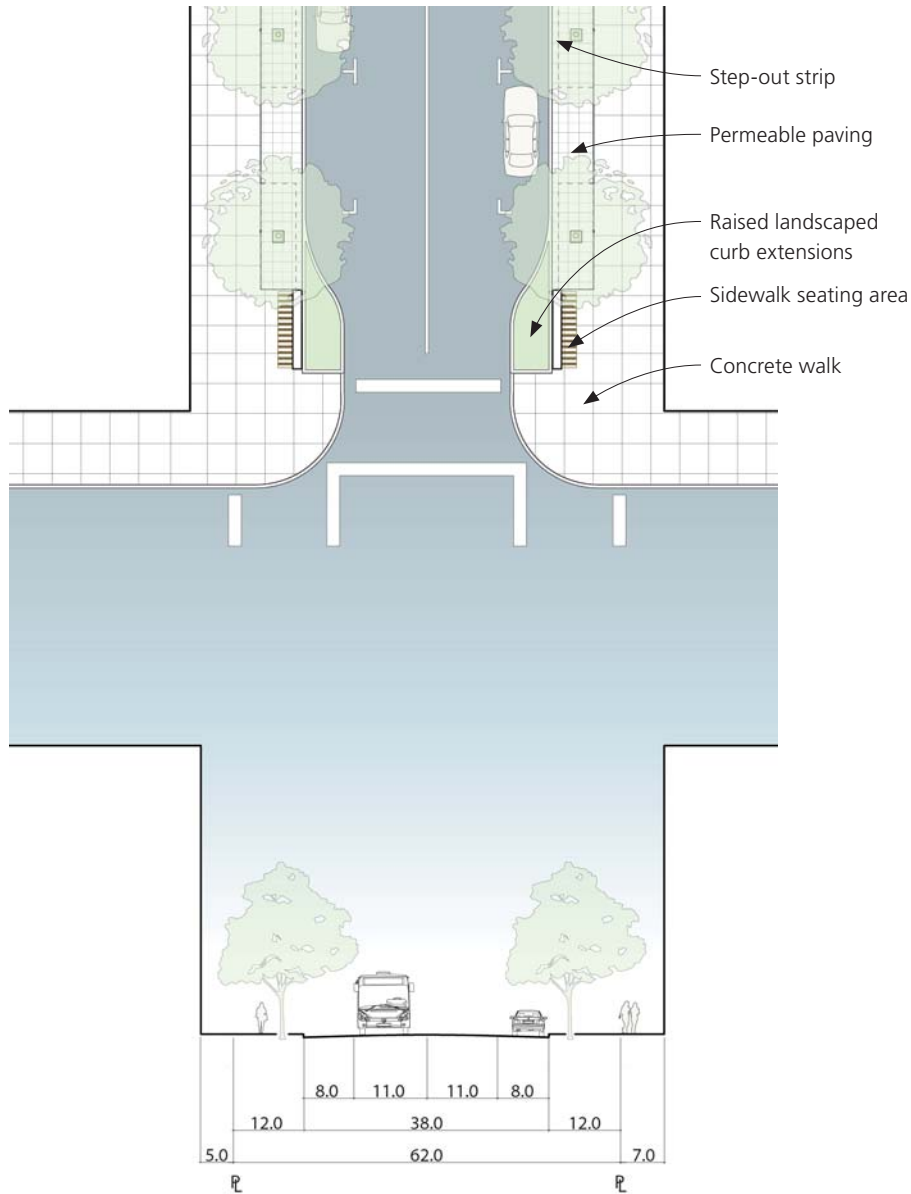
Westminster Boulevard and Gray Street Street Design Diagram
